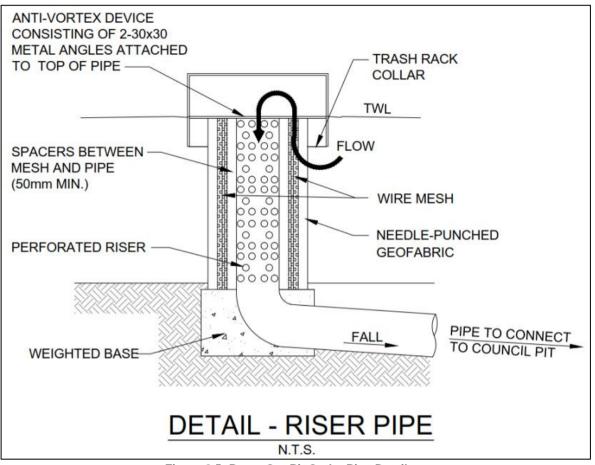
Pump Out Pit Outlet Pipe Detail
